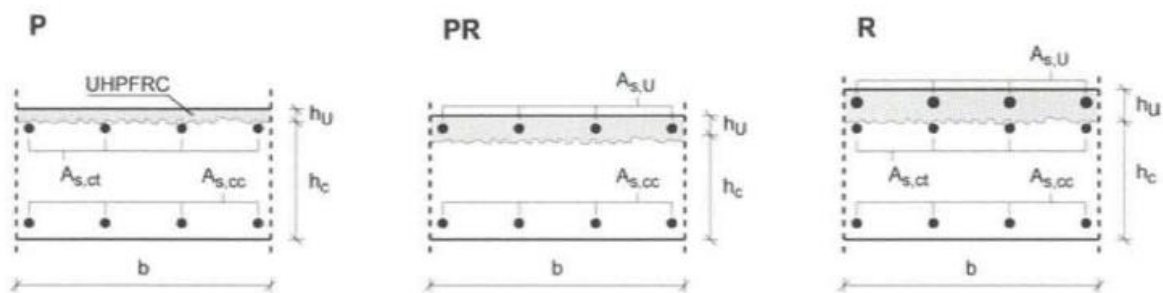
Geometries of "UHPFRC-concrete" elements for bridge deck slabs. Source: core.ac.uk.
